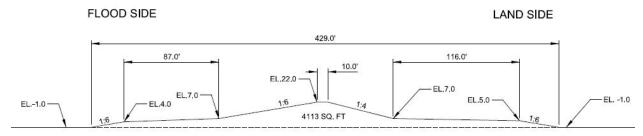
Typical Section Reach J-2 - Not to Scale (NTS)
